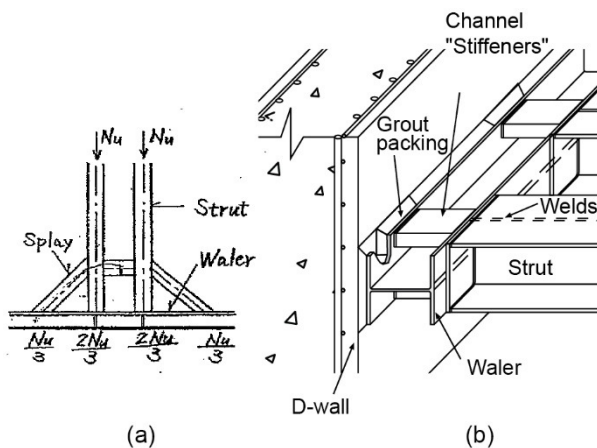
Waler stiffeners: (a) plate stiffeners; (b) channel stiffeners.
